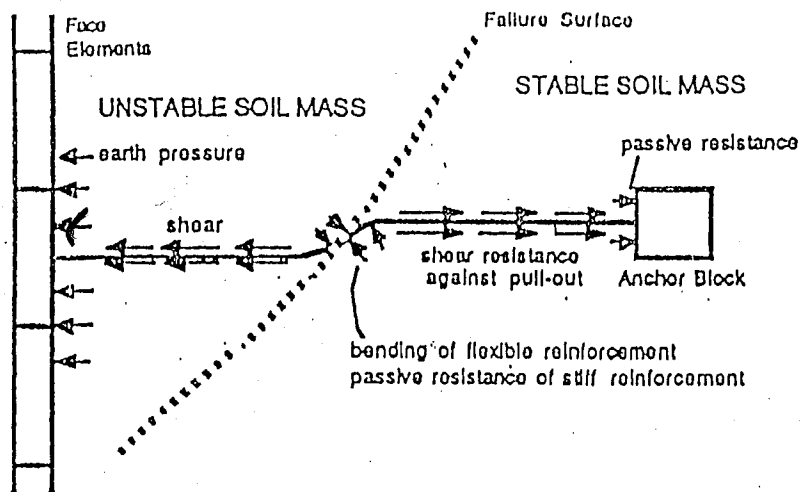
Mechanics of Reinforcement in Reinforced Earthwalls
